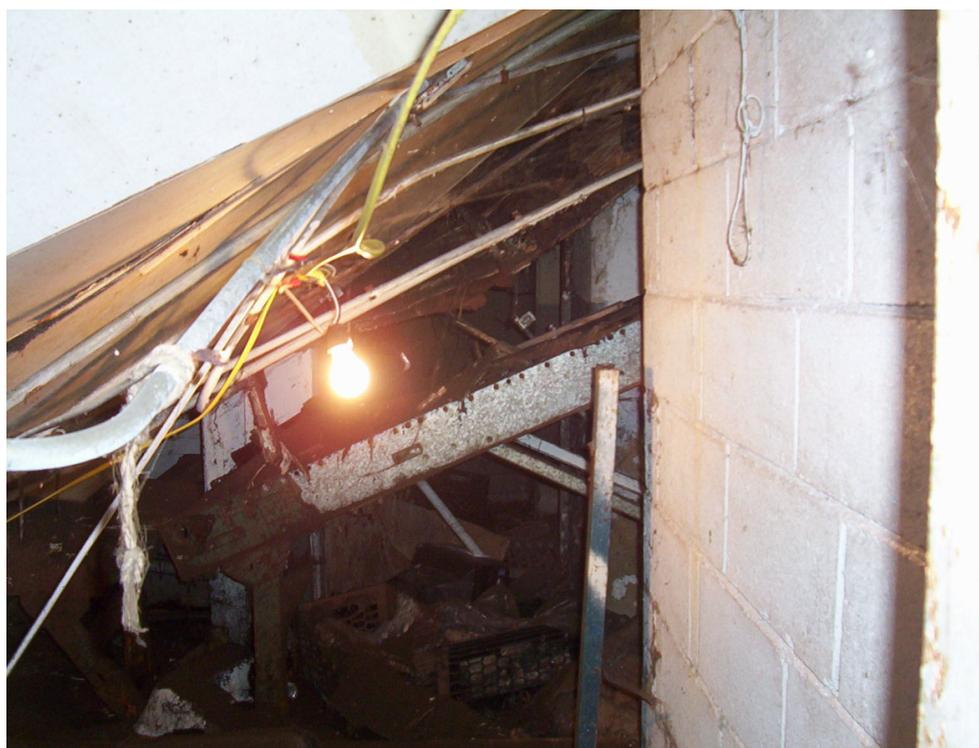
Collapsed ceiling in the basement of 42-46 10<sup>th</sup> Avenue.
